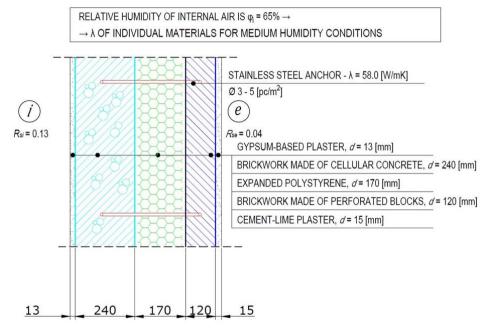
Sandwich composite comprising: load-bearing exterior wall (the building's envelope). Structure of envelope no. 2 (*author's archive*)
